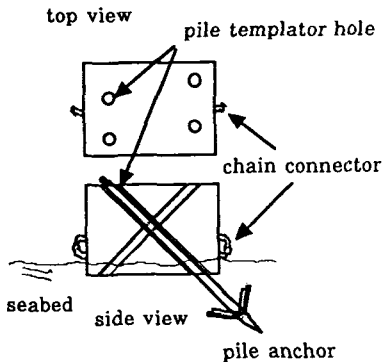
Suggested configuration of the revised concrete & pile anchor block for shallow sea.
